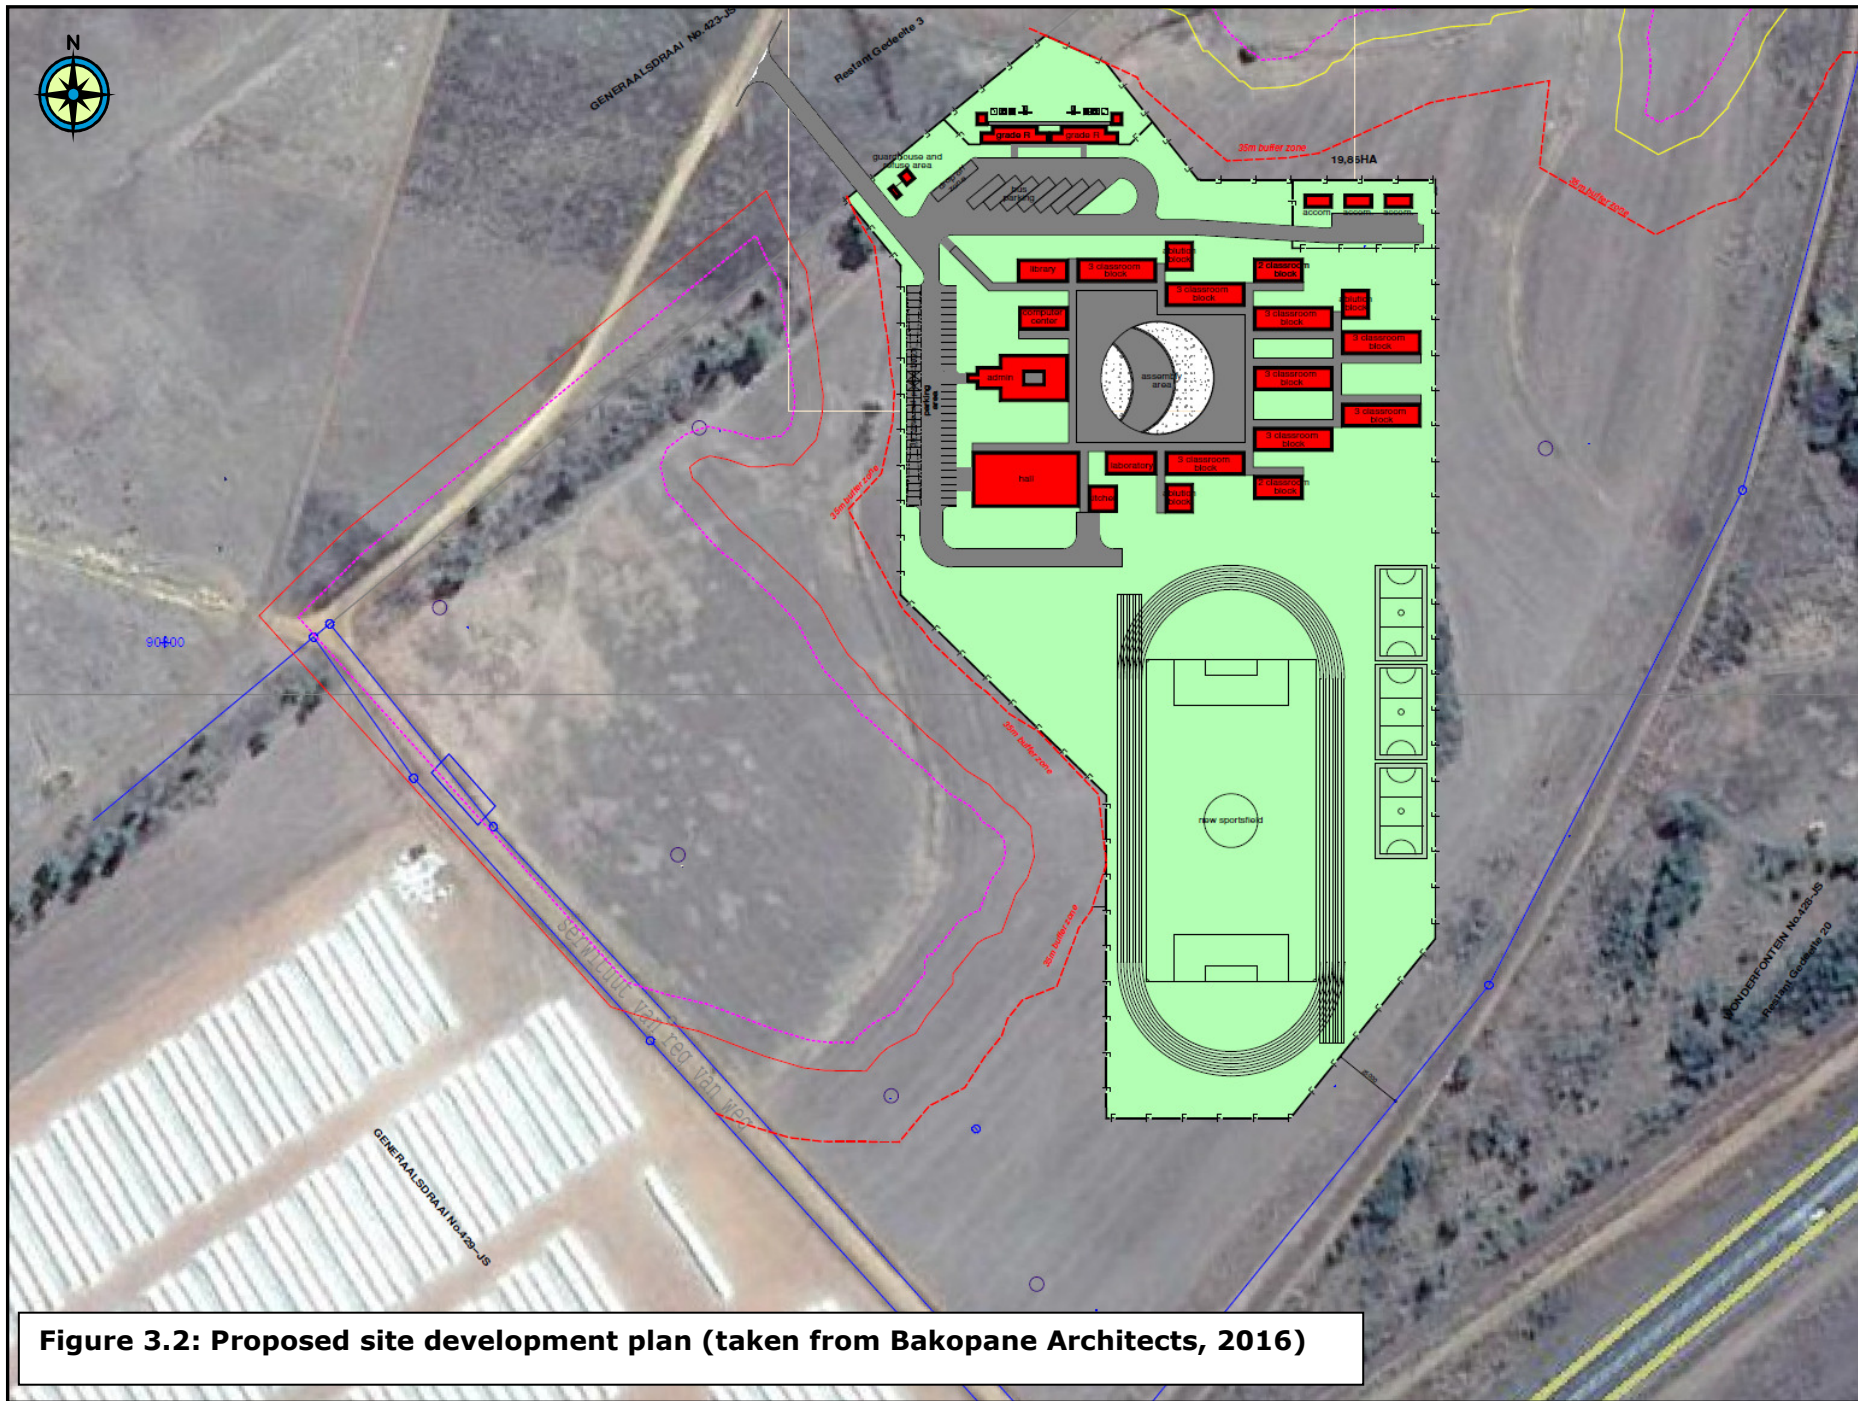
Proposed site development plan (taken from Bakopane Architects, 2016)
